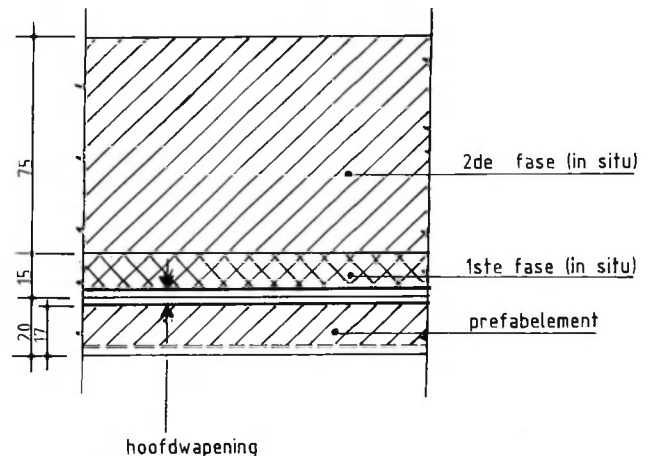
Concrete superstructure. Main reinforcement structure.
